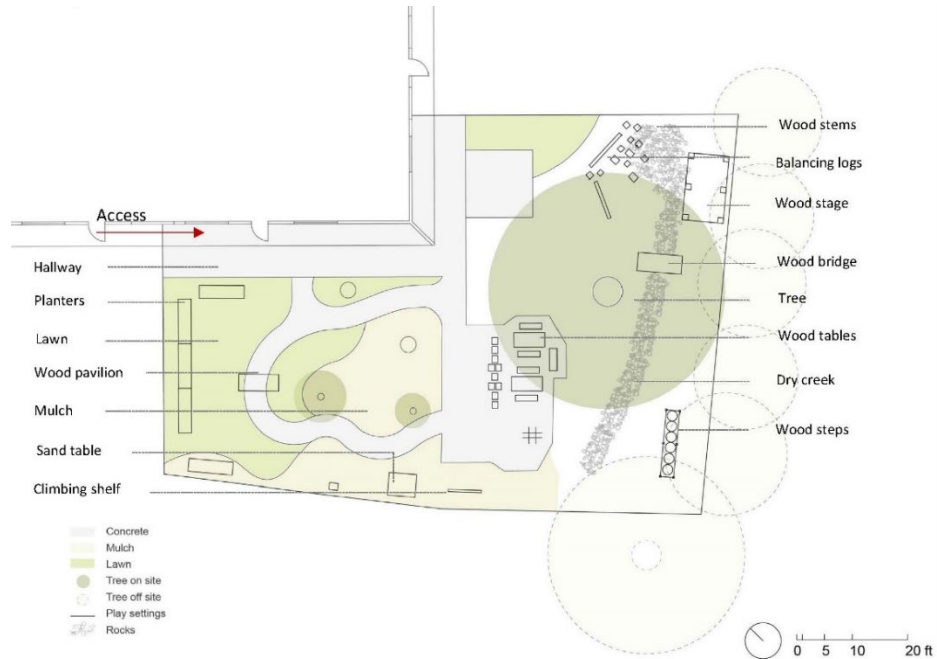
Outdoor Play Environment Site Plan: NBOPE.
